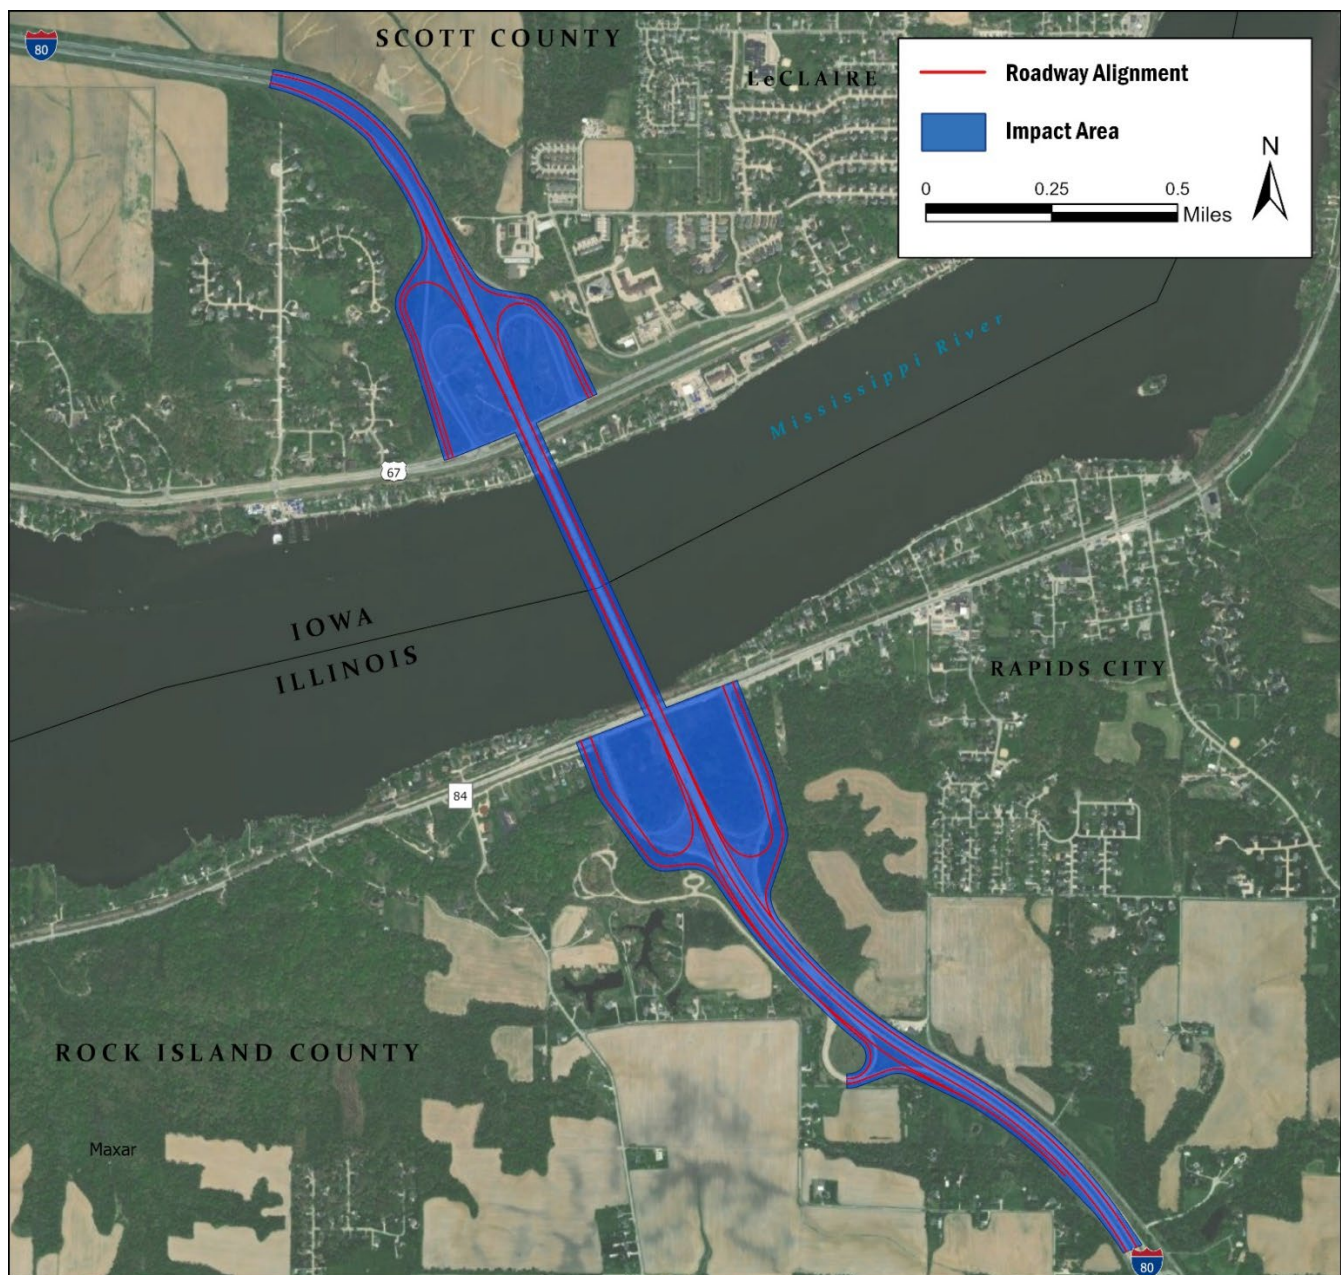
BRIDGE RECONSTRUCTION ALTERNATIVE
